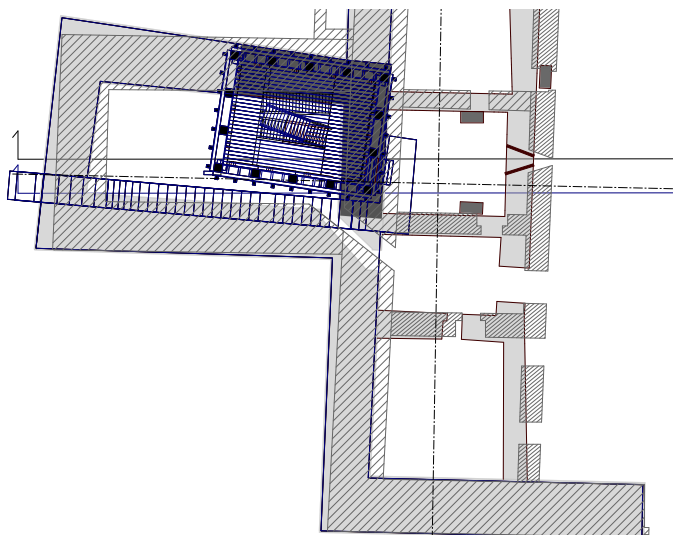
Lookout tower superimposed plan 1:400 (A4)
